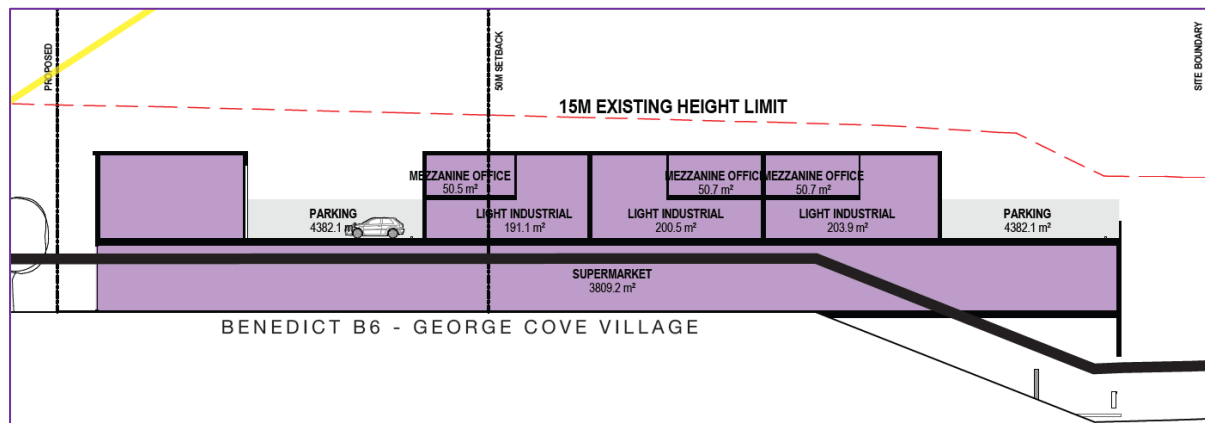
Side view of proposal looking west (Source: Rothelowman Planning Proposal Design Report)
